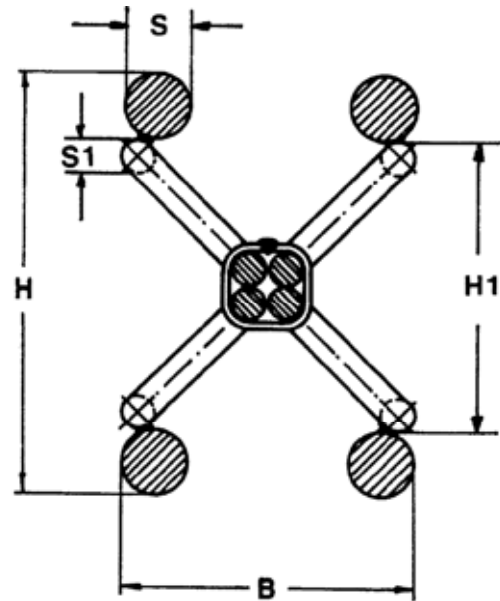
Specifications of Pantex 3-stringer PS-girders (Tunnel-Ausbau-Technik Ltd., Germany)
